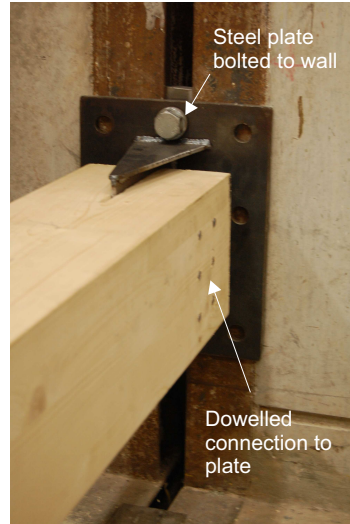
Support for cantilever beam tests showing the six-dowel connection spruce.
